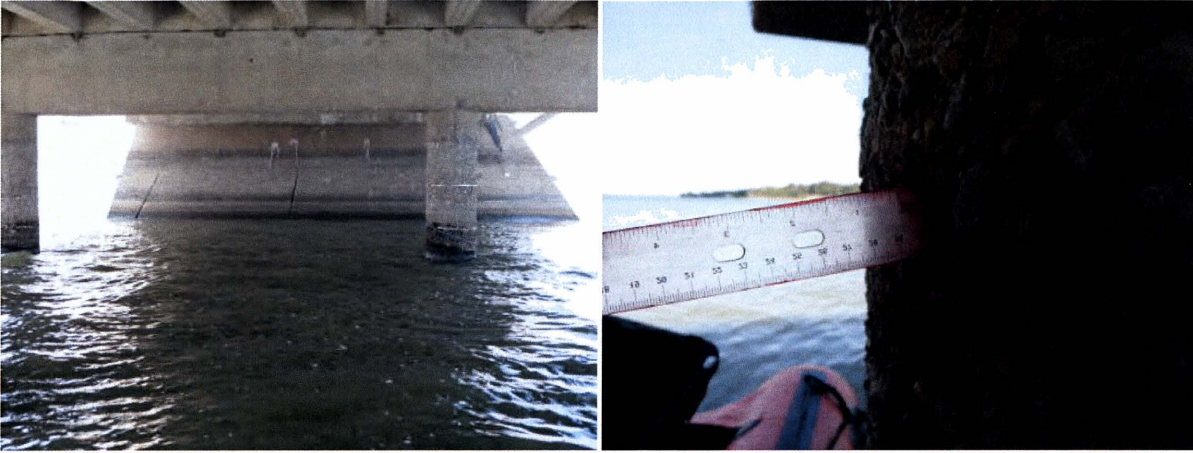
Overview of Bridge Deterioration (Bridge 11).
